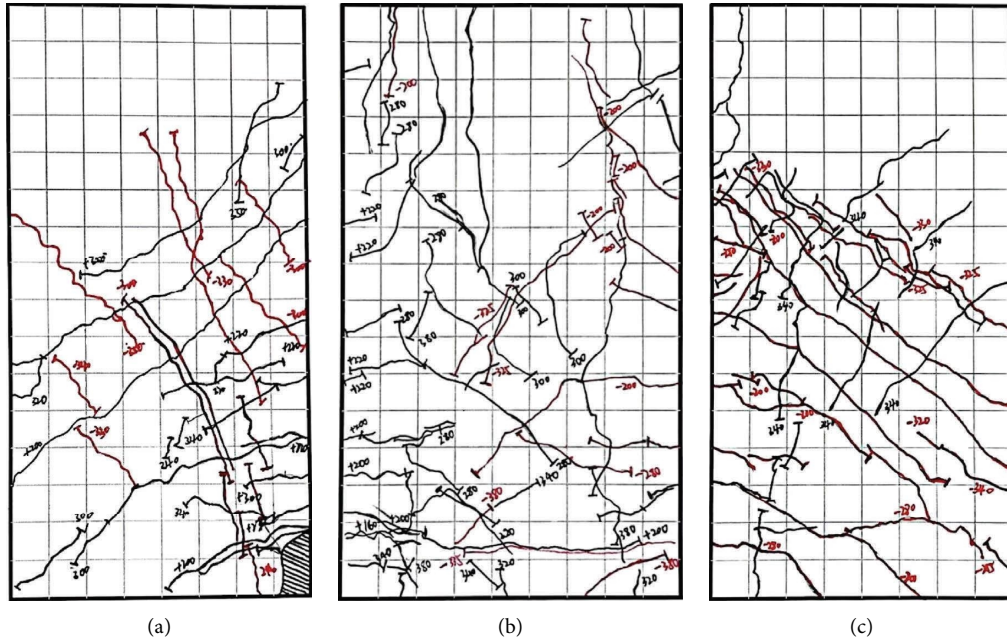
Damage results of URC-X specimen. (a) Wall limb 1. (b) Web. (c) Wall limb 2.
